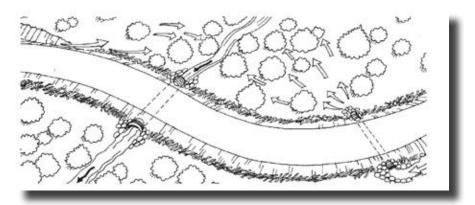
Basic road surface drainage with leadoff ditches and culvert cross-drains exiting into a vegetated buffer area before entering the stream. (Adapted from Montana State University 1991)
